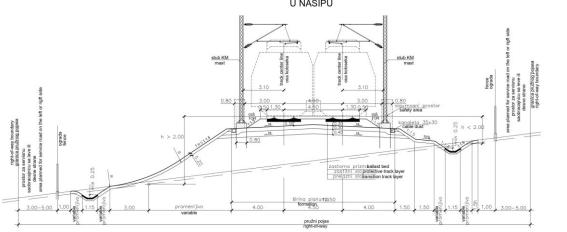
TYPICAL CROSS SECTION ON THE EMBANKMENT
